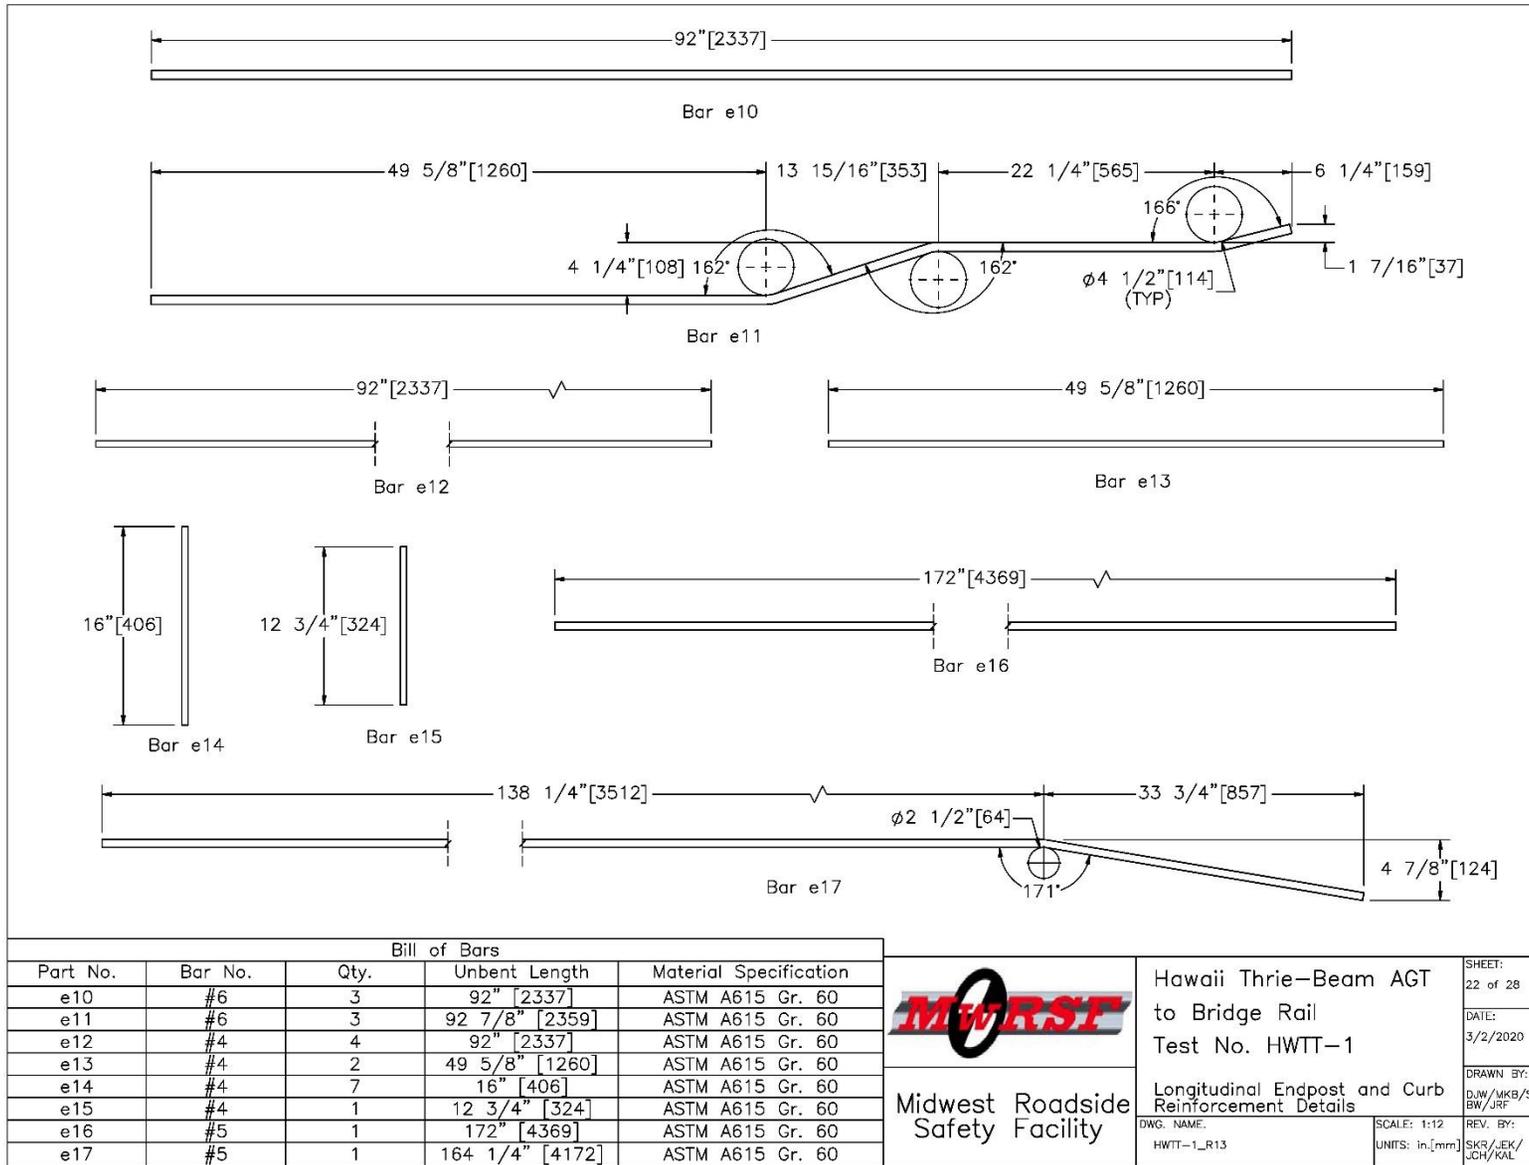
Longitudinal End Post and Curb Reinforcement Details, Test Nos. HWTT-1 and HWTT-2
